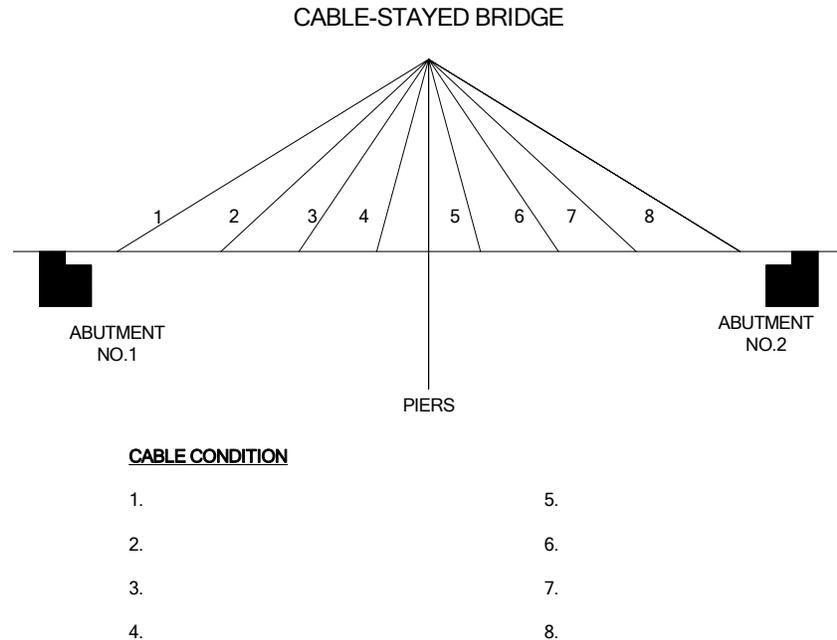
Form for Recording Defects in Cable System of a Cable-Stayed Bridge
